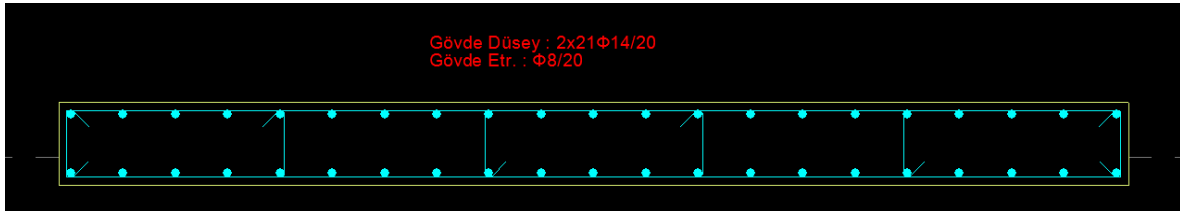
Shear Wall Reinforcement Plan of 4 Storey Building (dimensions: 380cm/30cm)
